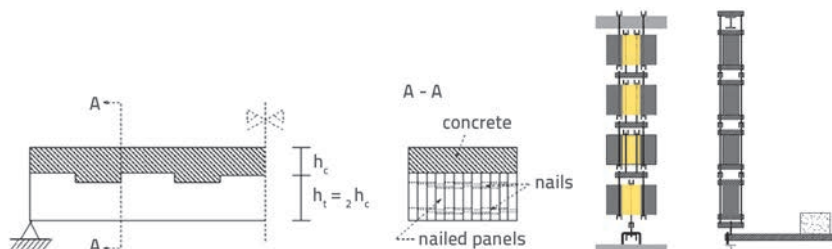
Floor and cross section of the case study by Jorge et al.; Samples ready for long-term testing [18]
